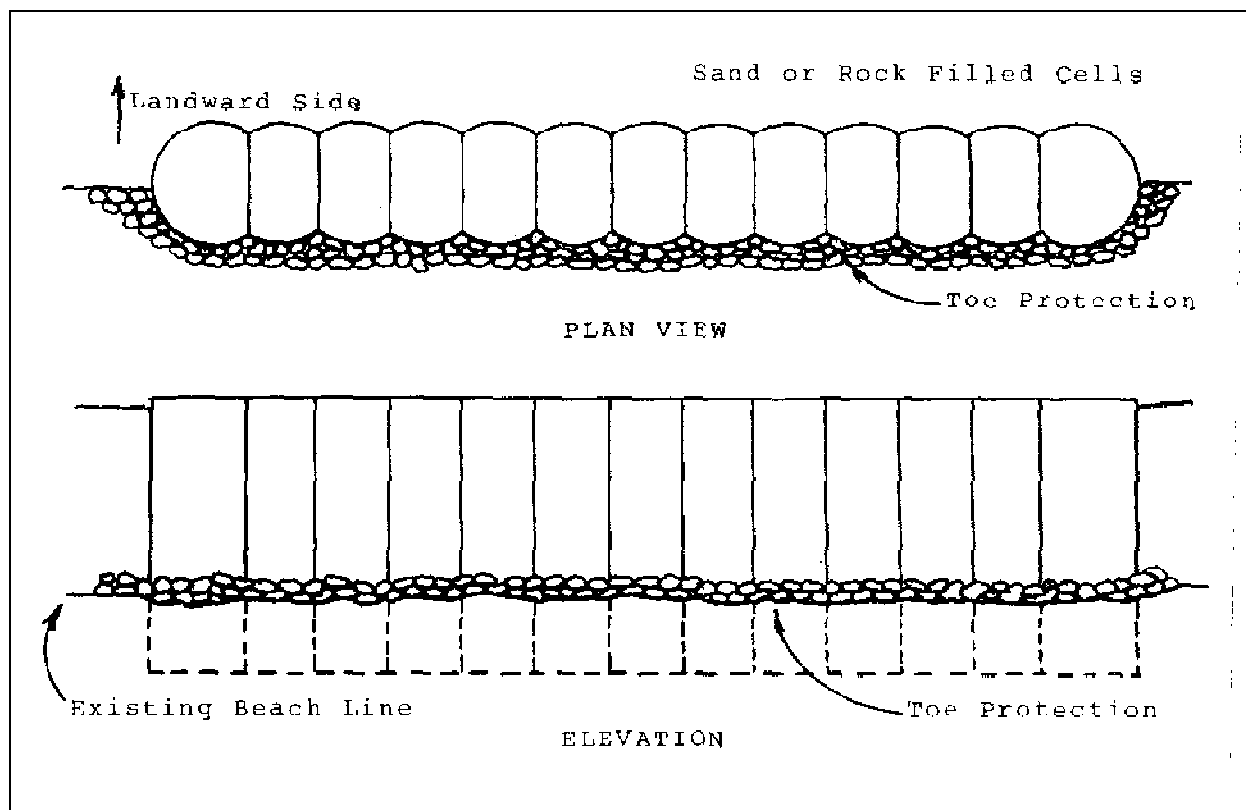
Cellular steel sheet-pile bulkhead plan and cross section
